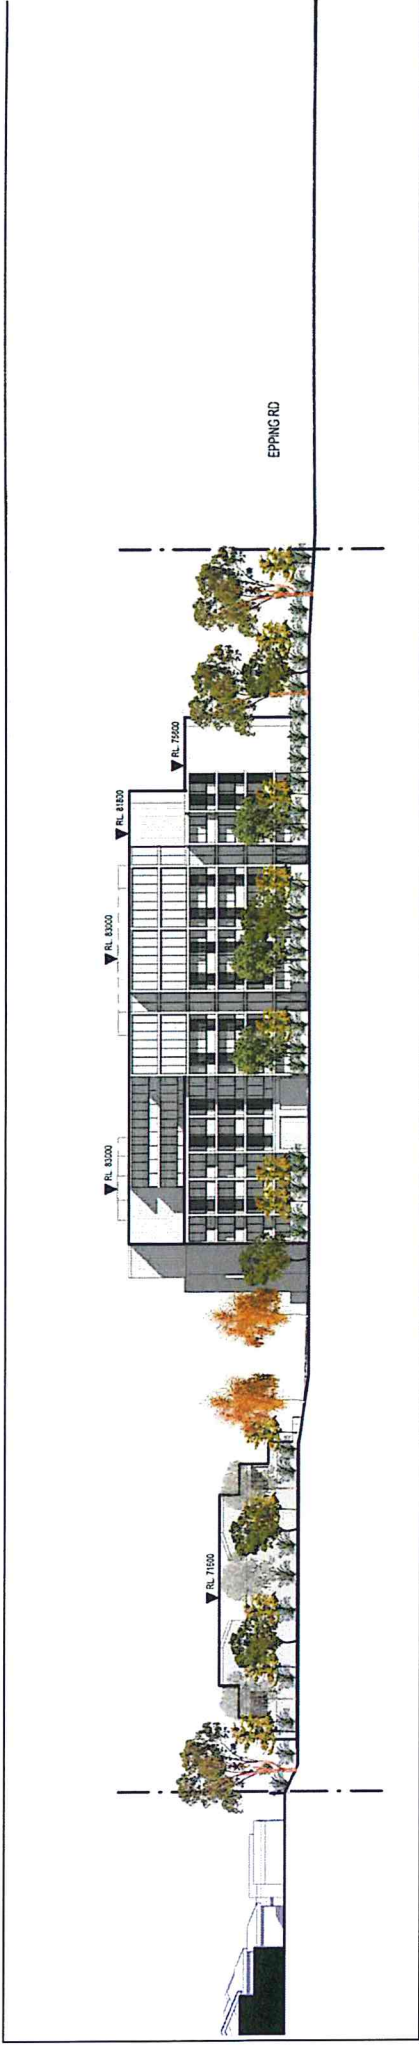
B: Eastern elevation illustrating Building A and Building B- February 2013 Amended Concept Plan (source: SJB Architects)
